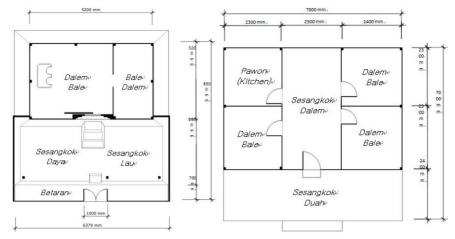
Left: Floor plan of the typical Bale Tani; Right: Floor plan of Bale Bontar (not typical)
